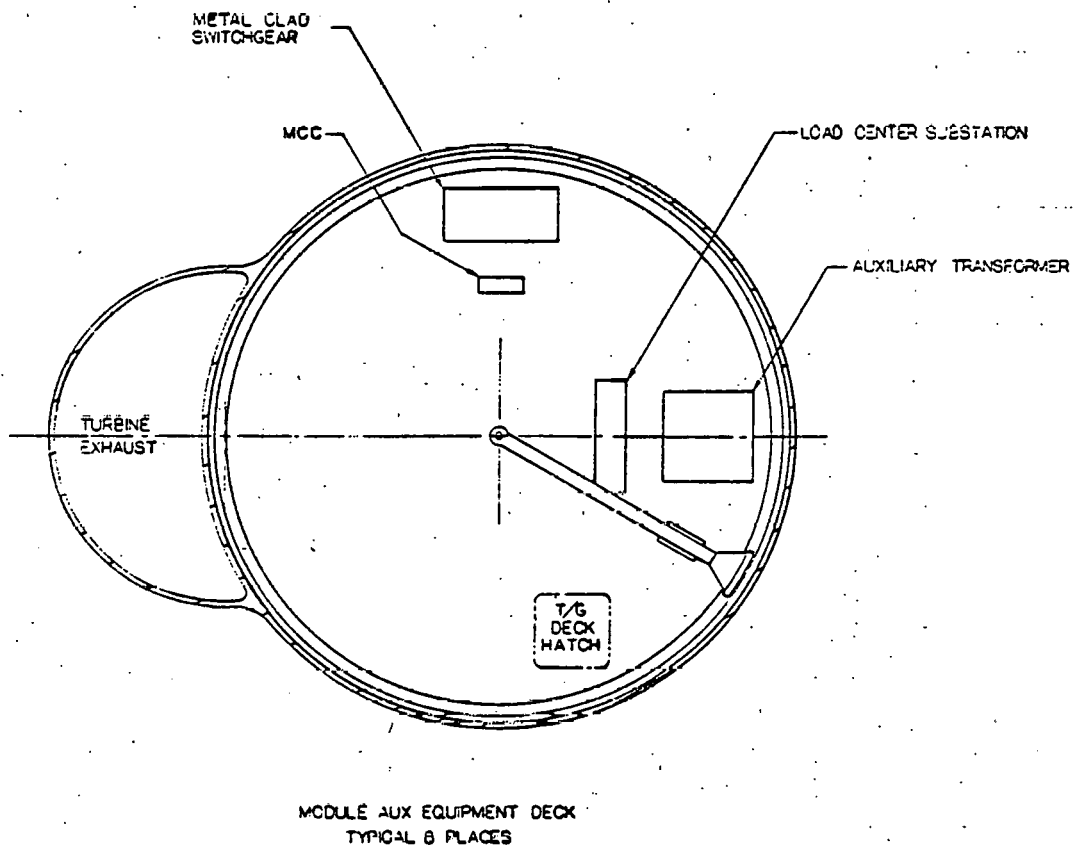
Standby Power and Auxiliary Electrical Equipment Arrangement, 400-MW(e) Spar, Module Auxiliary Equipment Deck
